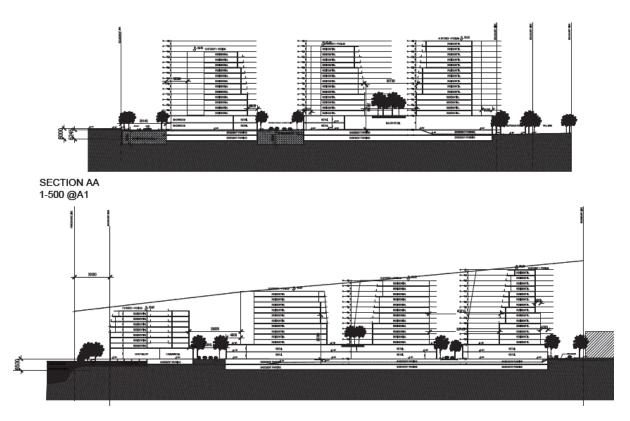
PROPOSED BUILDING ENVELOPES – SITE CROSS SECTIONS
